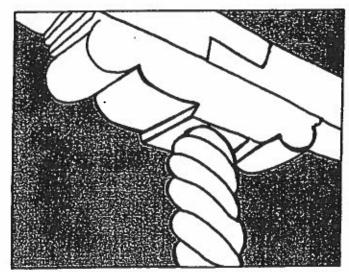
(above): Spanish/Pueblo Revival Style architectural detailing, including portal, canales and exposed vigas.
